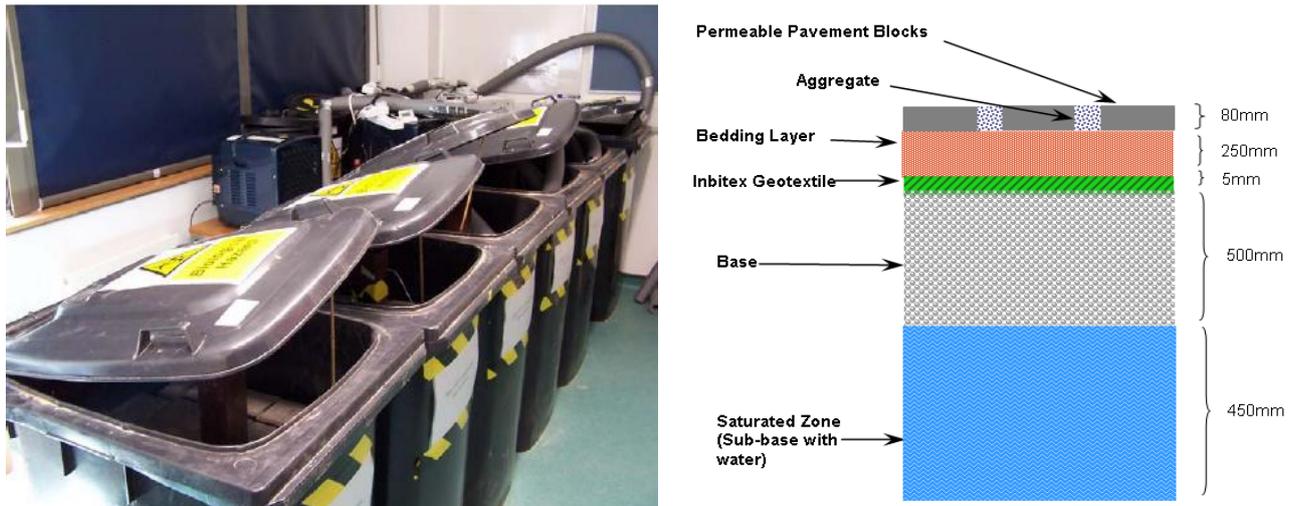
Indoor Experimental rigs and schematic layout of permeable (pervious) pavement systems with integrated ground-source heating and cooling elements.
